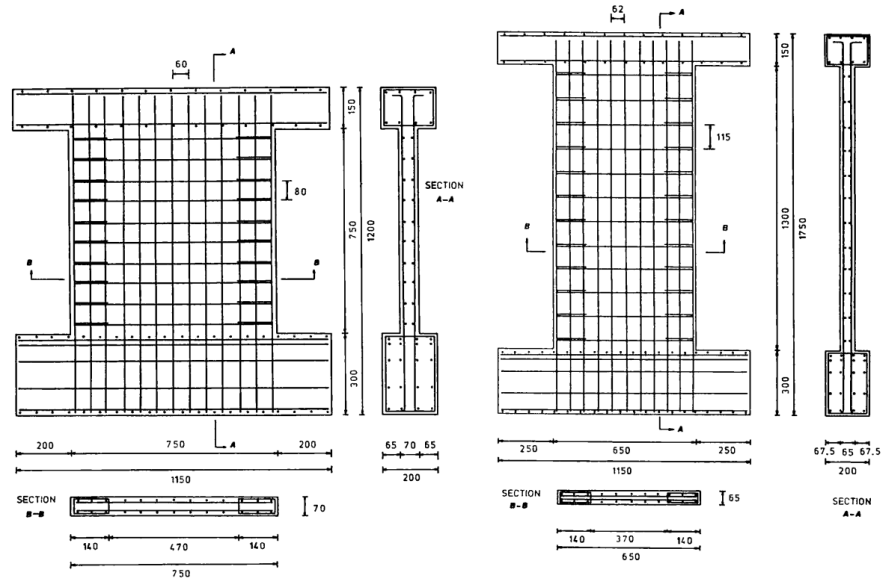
Details of the wall specimens tested by Lefas et al. (1990)
